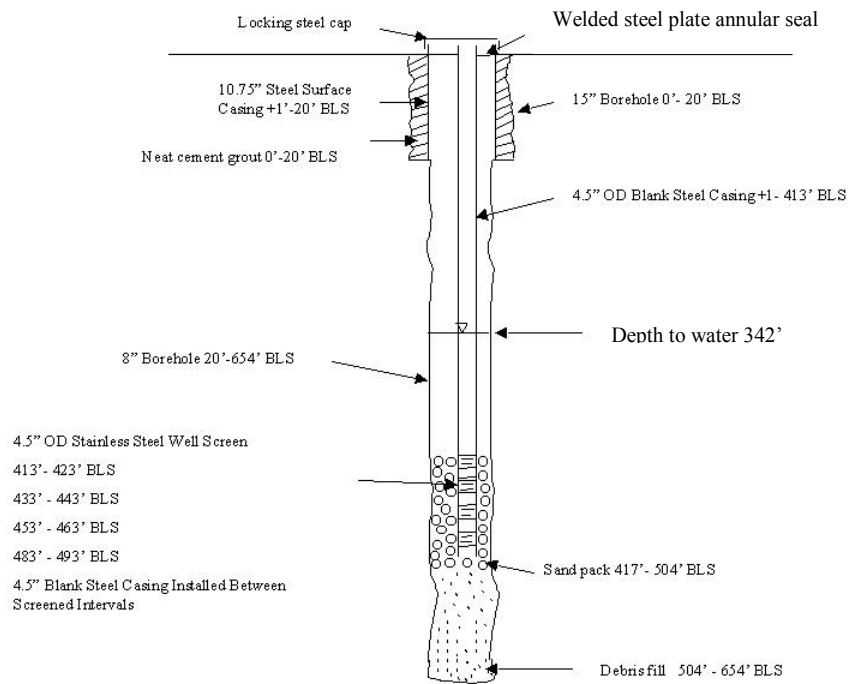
As-built well construction drawing for B(16-1) 23ACA
